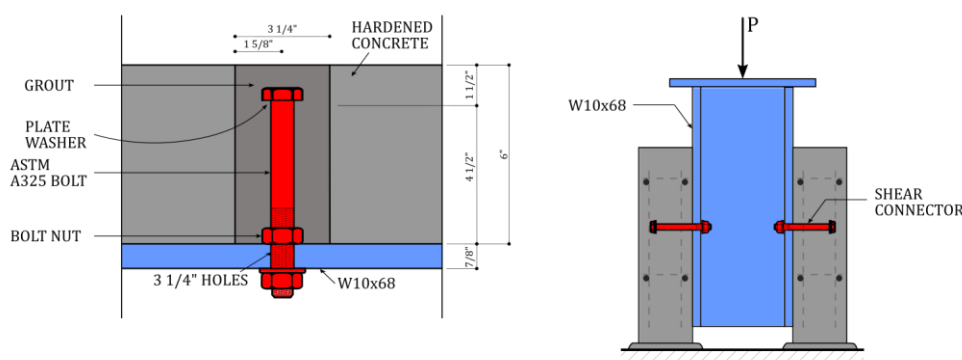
Detailing of the post-installed, double-nutted bolted connector and push specimen [21]
